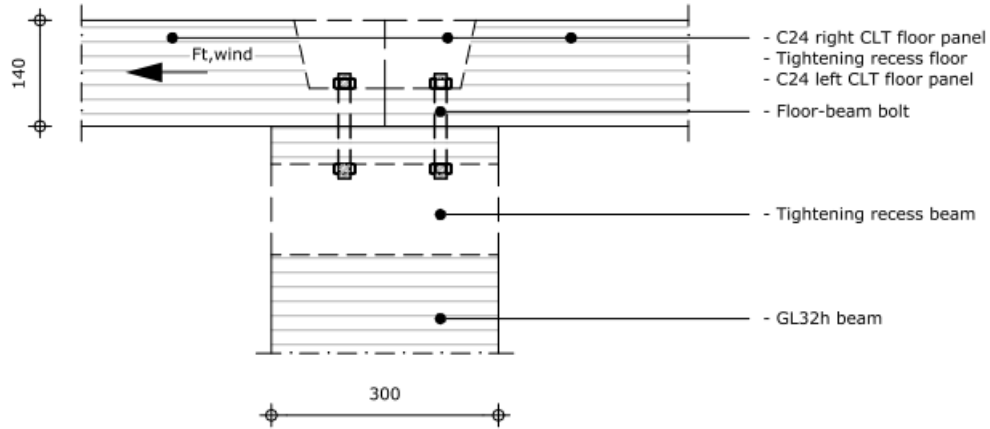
Cross-section C-C of Figure 10-7 floor-to-beam connection wind force in mm
